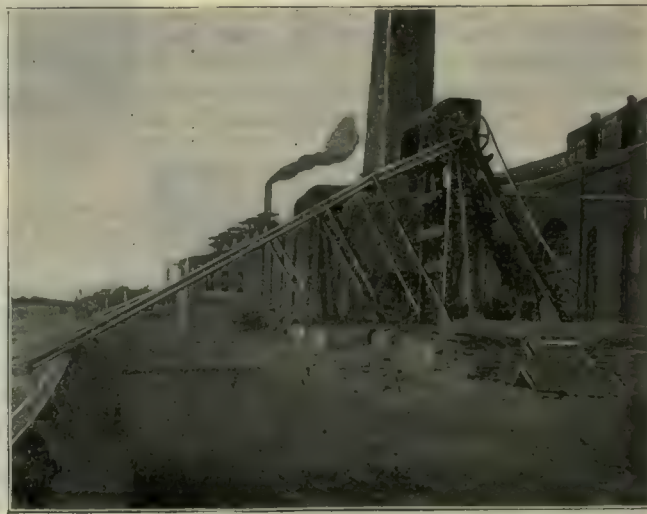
ICE ELEVATORS AT PUMPING STATION.
